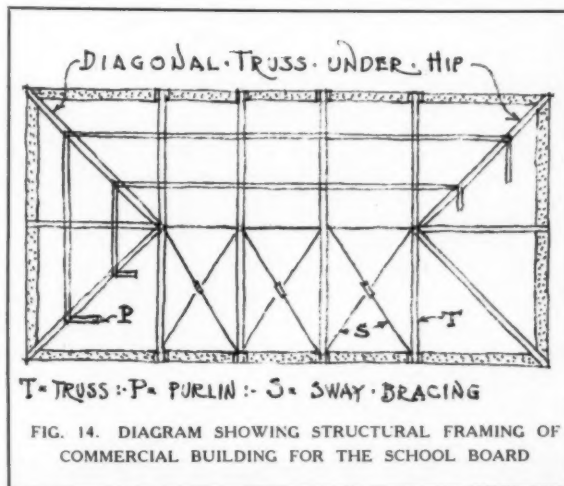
DIAGRAM SHOWING STRUCTURAL FRAMING OF COMMERCIAL BUILDING FOR THE SCHOOL BOARD
